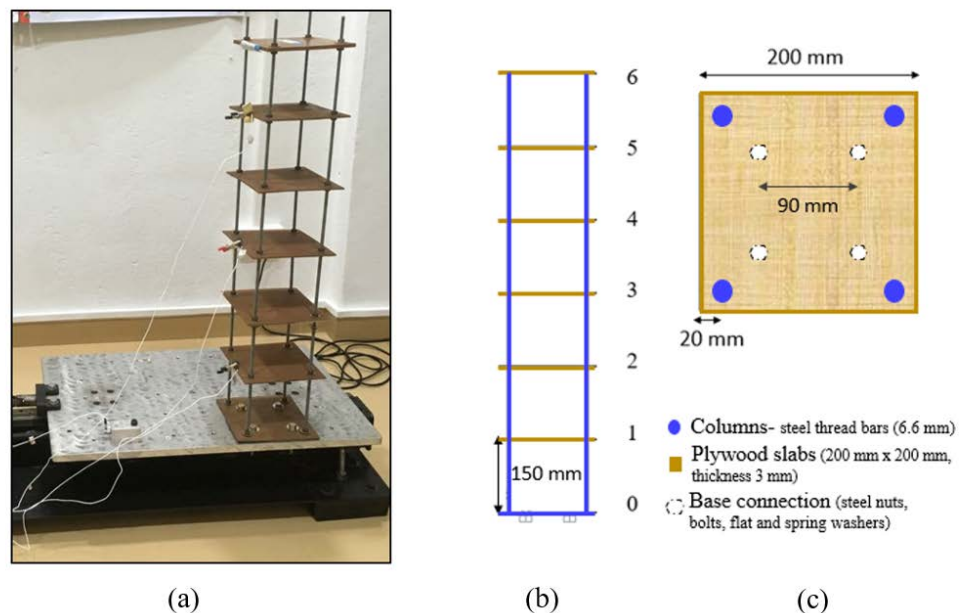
Preliminary shaking table framed model (a) mounted on shaking table deck (b) schematic diagram (side elevation) (c) plan elevation of the base slab with connections
